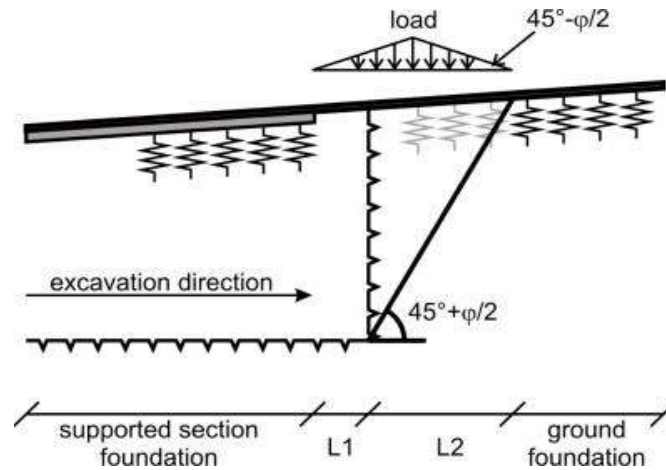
Pipe roof support model showing the load and the foundation ahead and behind the face (Volkmann and Schubert, 2010) [L1 - Unsupported span; L2- Disturbed ground foundation]
